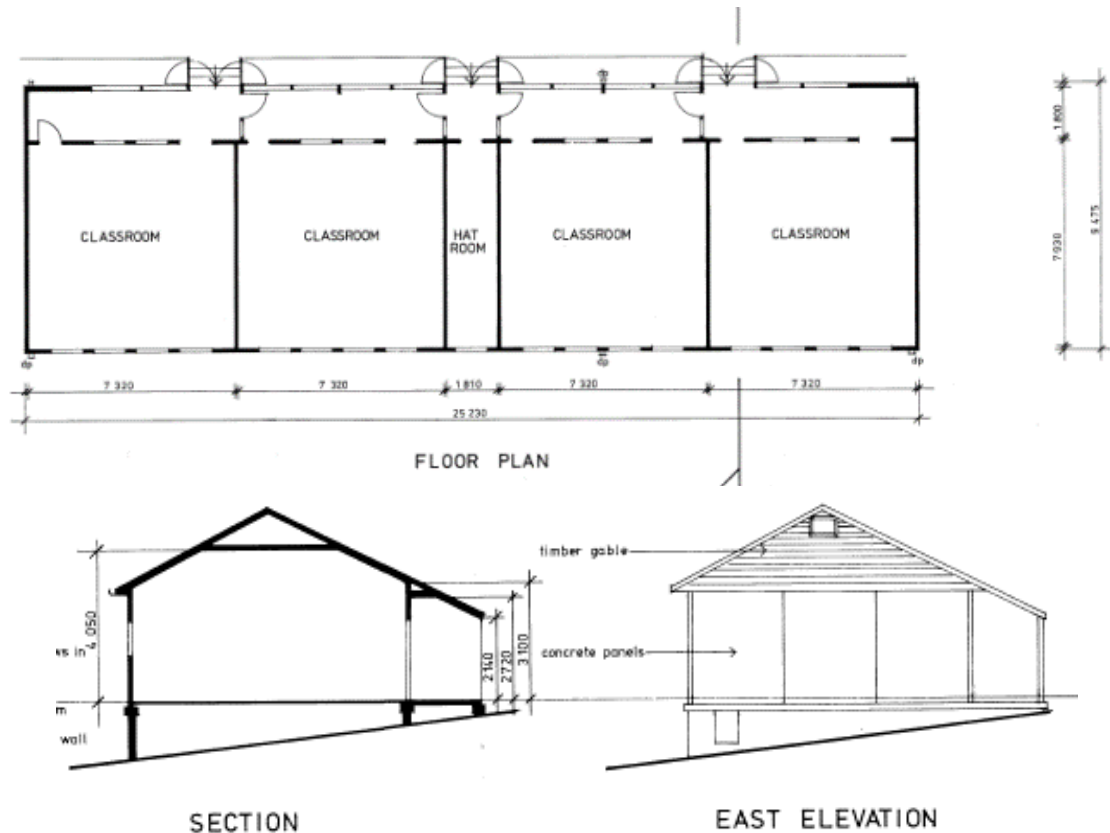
The Haven, Floor Plan (top) Section and East Elevation (bottom). Source: Robertson & Hindmarsh Architects, 1994
